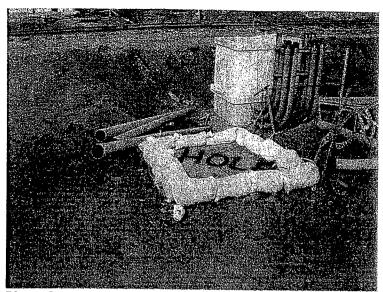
Inlet in NOV Photo 5 has been removed and new DI is being installed.
